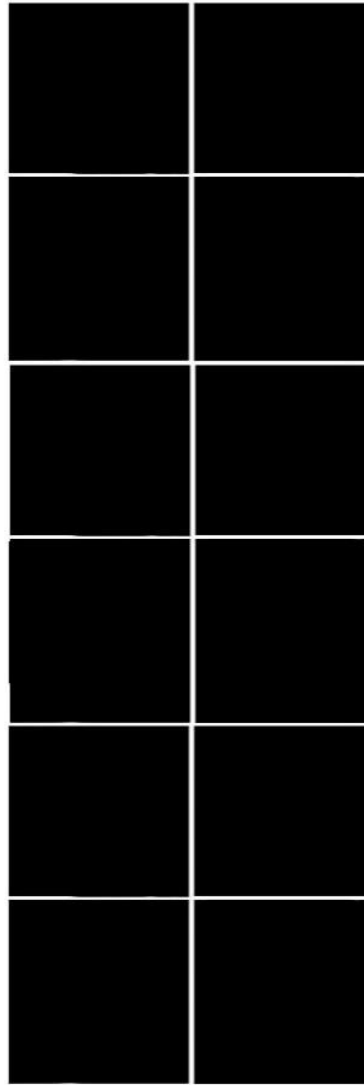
Section of bitumenous boards to be displayed on the floor and wall of the gallery.
